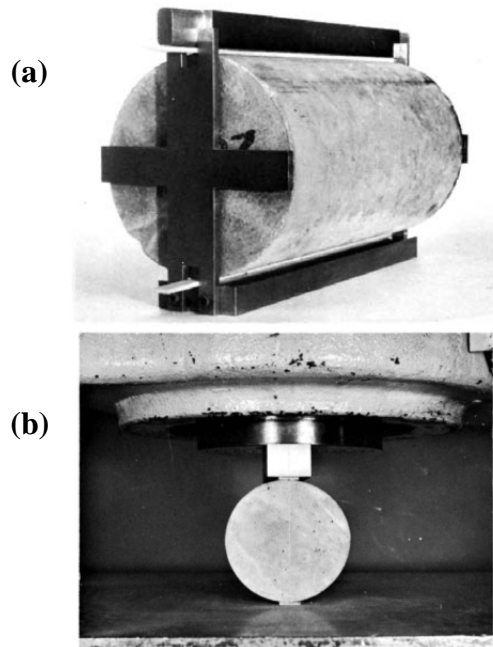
Test specimen positioned in (a) jig for aligning cylinder and bearing strips and in testing machine for determination of splitting tensile strength (ASTM C496 2011)
